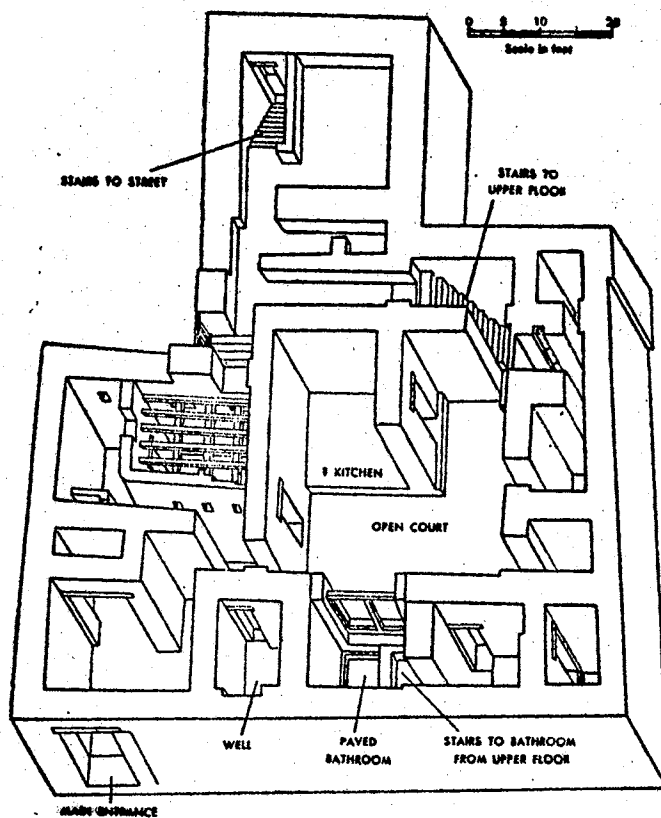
Ground Plan of an Upper Class House at Mohenjo-daro
